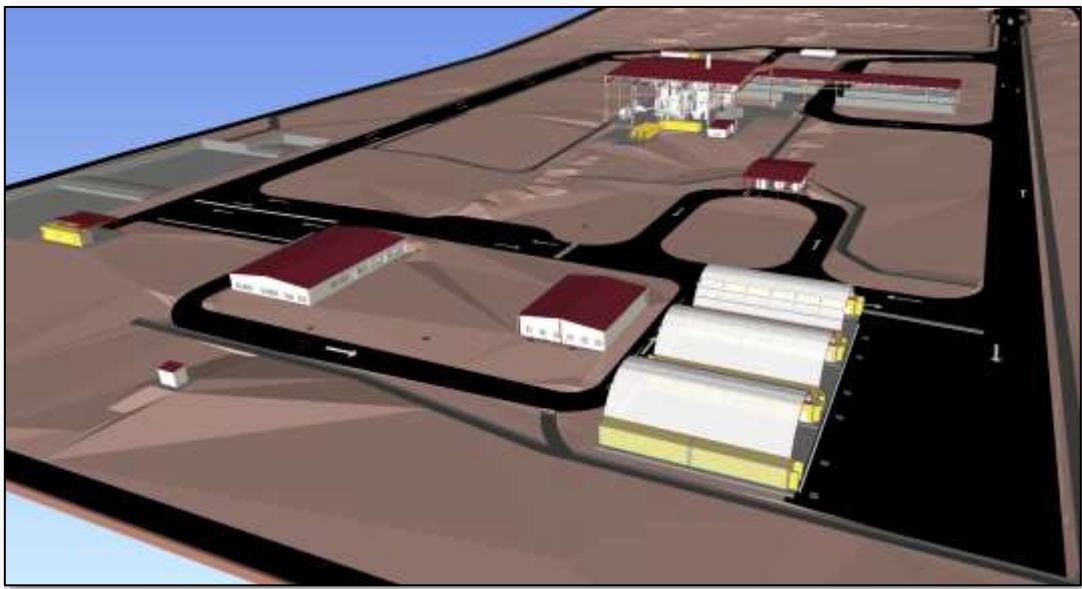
Plant layout at the Subantando Fertilizer Plant site, Angola.
